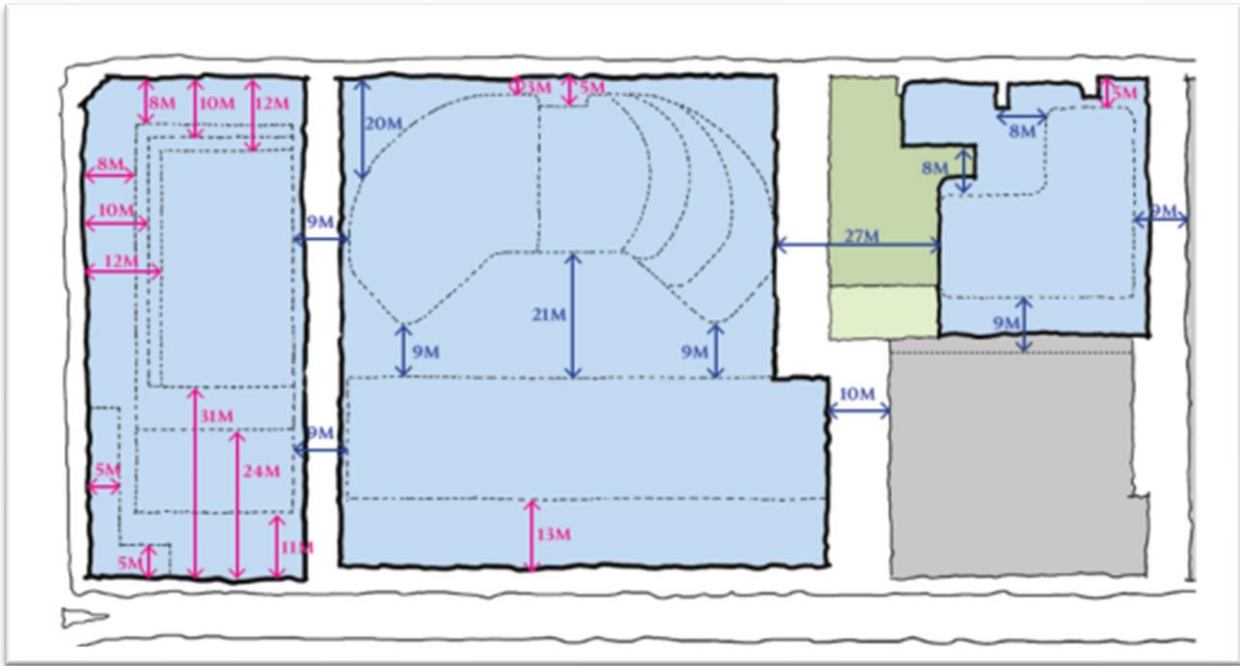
Proposed setbacks within the DP. Source: Development Plan (Gurner 2023)
